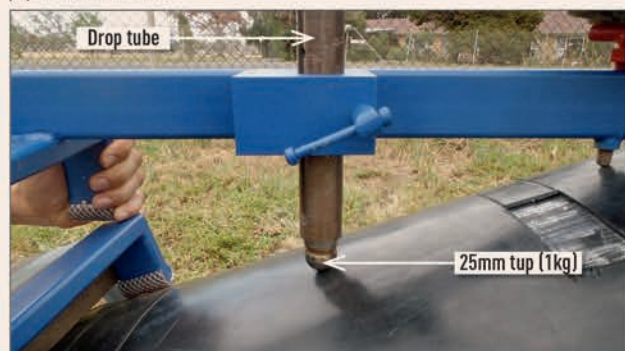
Site 3, Geelong, 2013. Impact test set up on the above ground section.
